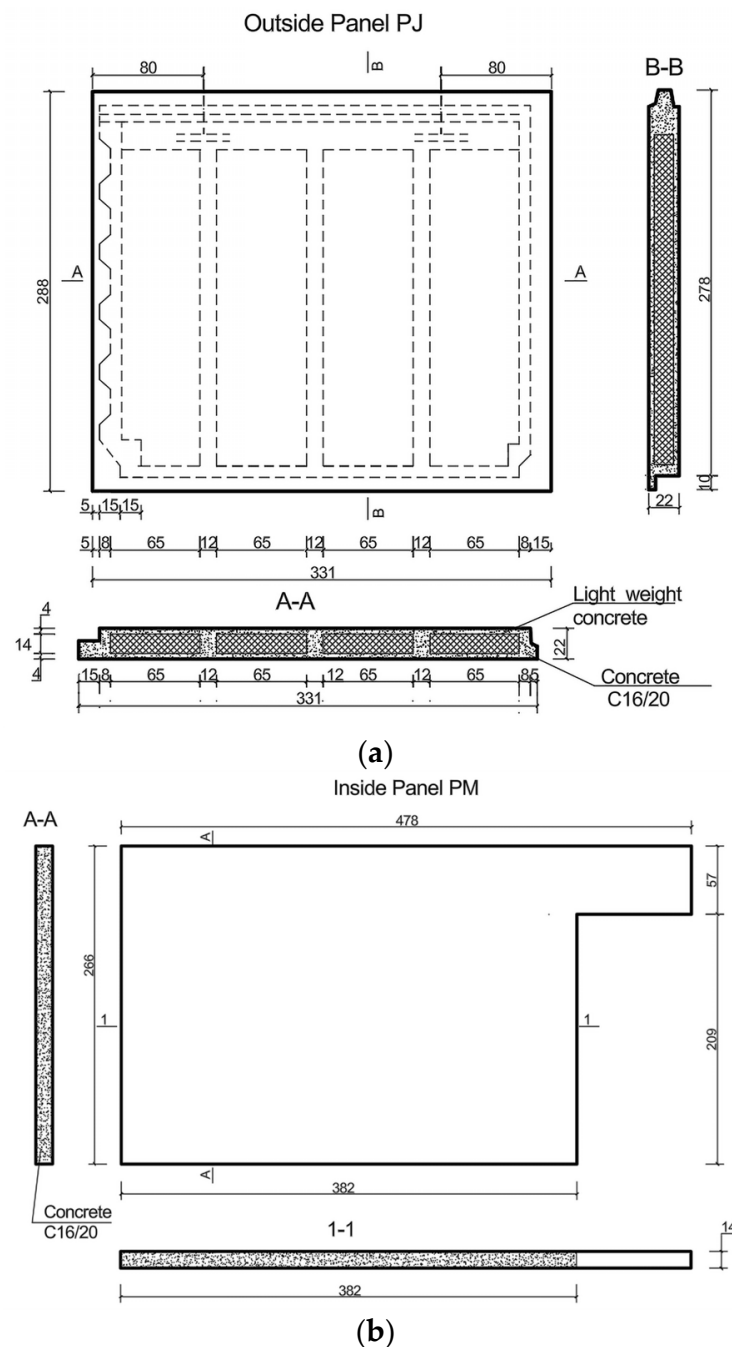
Typical precast RC wall panels in LPBs: (a) an exterior non-load-bearing wall panel (PJ type) composed of lightweight concrete and regular concrete and (b) an interior load-bearing wall panel (PM type) constructed using regular concrete (all dimensions in cm).
